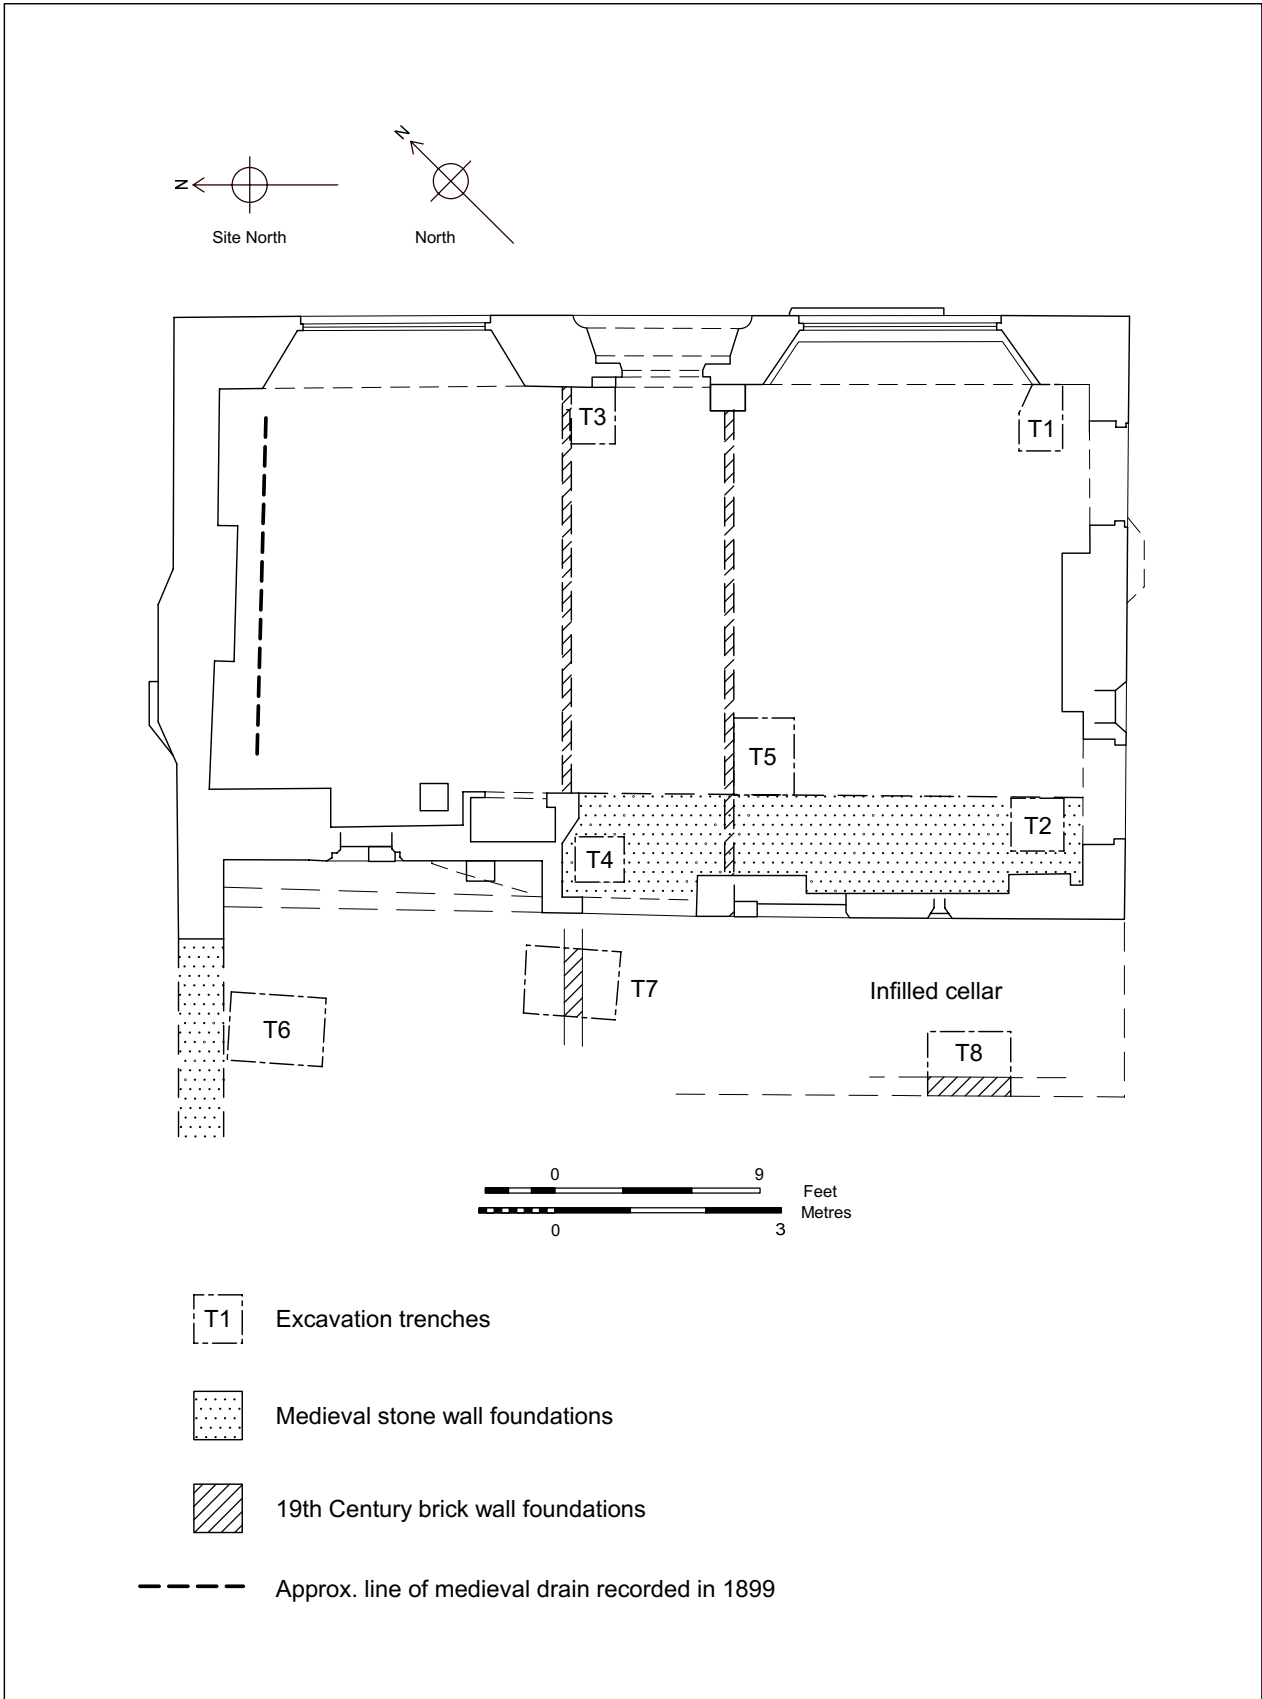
Former St. Mary's Vicarage, The Newarke, Leicester: Excavation Trench Locations. Scale 1:100.
